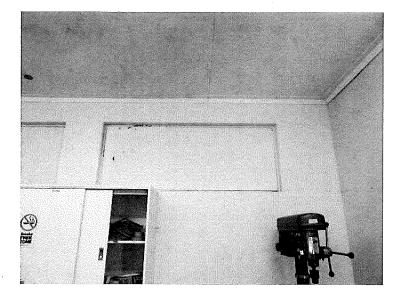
ACMA Facility Main Building interior workshop covered windows
